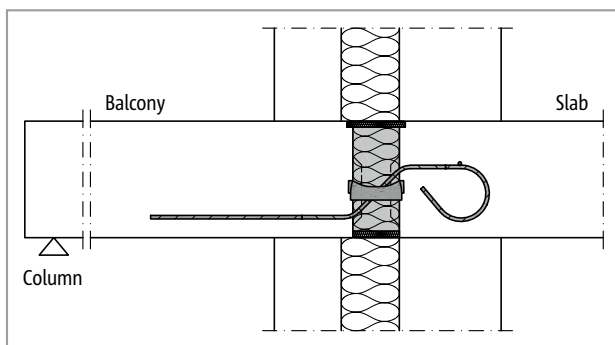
Schöck Isokorb® T type Q: Connection with non-load-bearing cavity masonry (e.g. T type Q-V1 to T type Q-V5)
